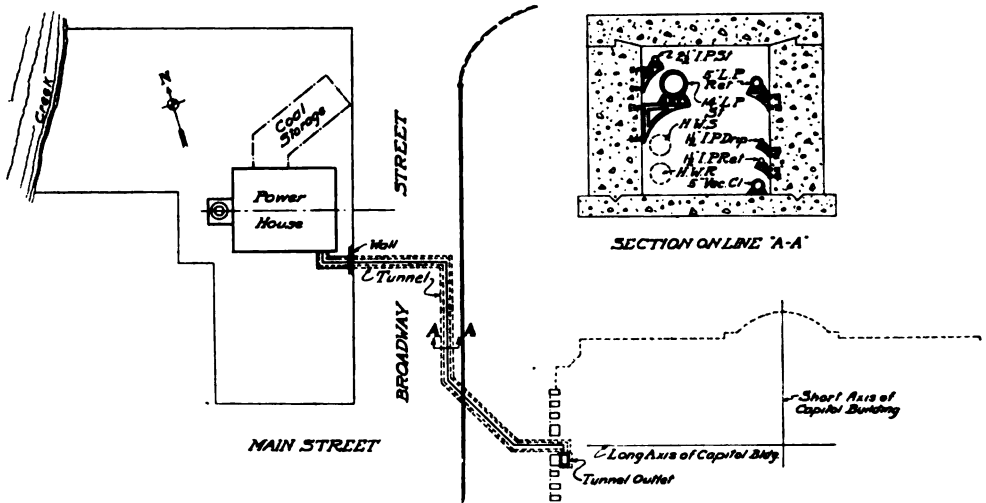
PLOT PLAN OF MISSOURI STATE CAPITOL AND POWER HOUSE AND PIPE TUNNEL.
